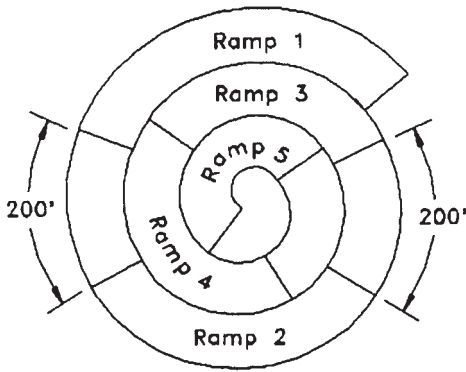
Plan view showing ramp locations for a five bench mine.
